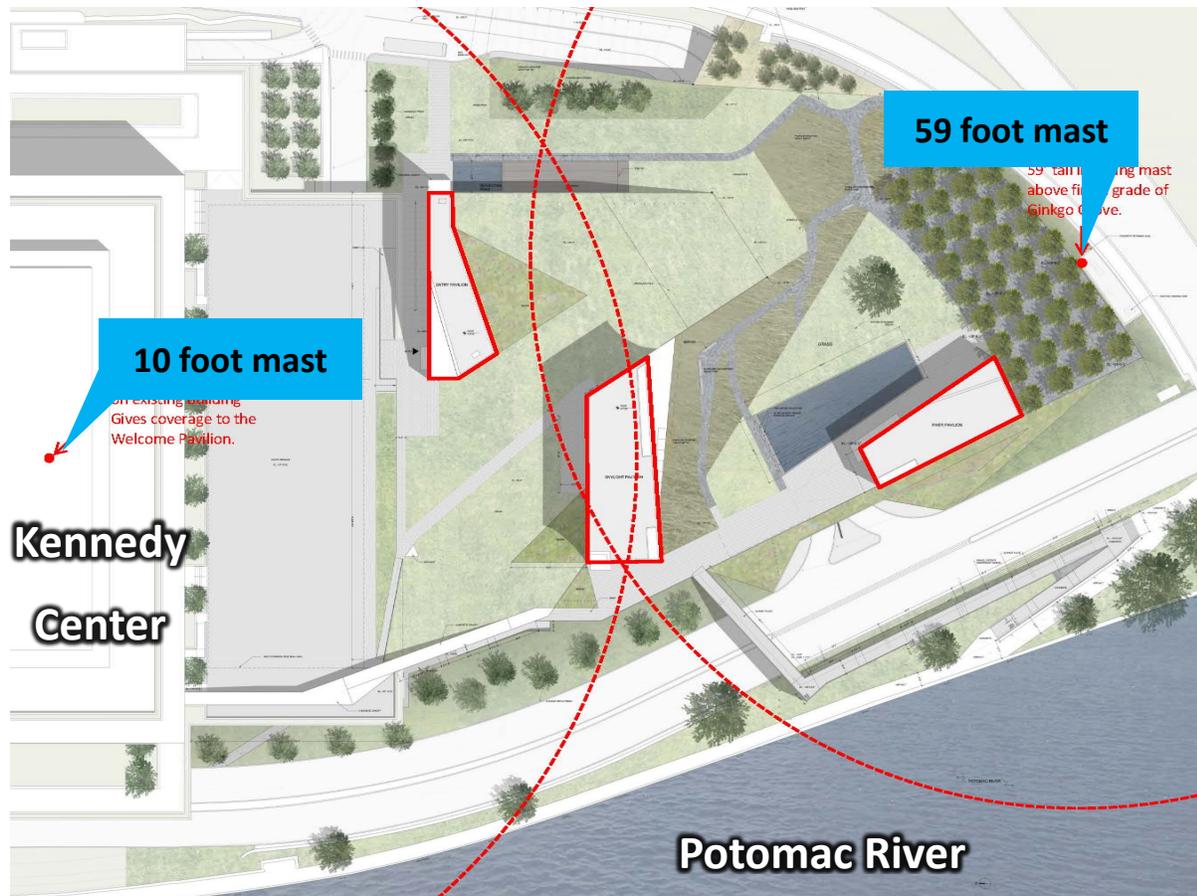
Site Plan of Kennedy Center Expansion with Lightning Protection masts identified
